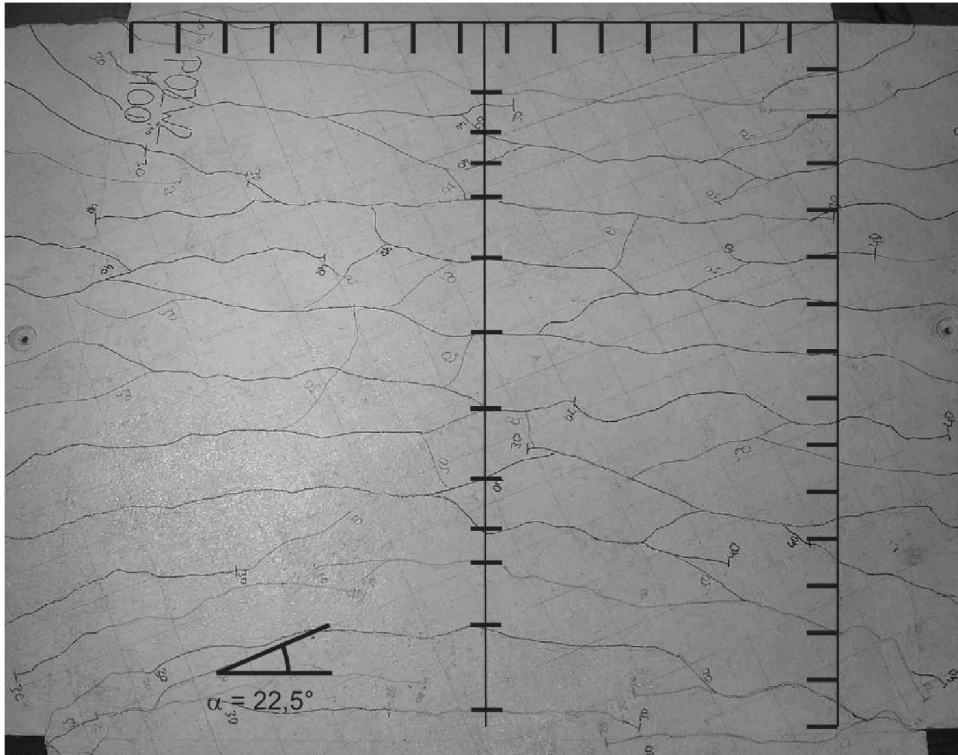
crack pattern of slab specimens with 22.5° reinforcement net [81]
